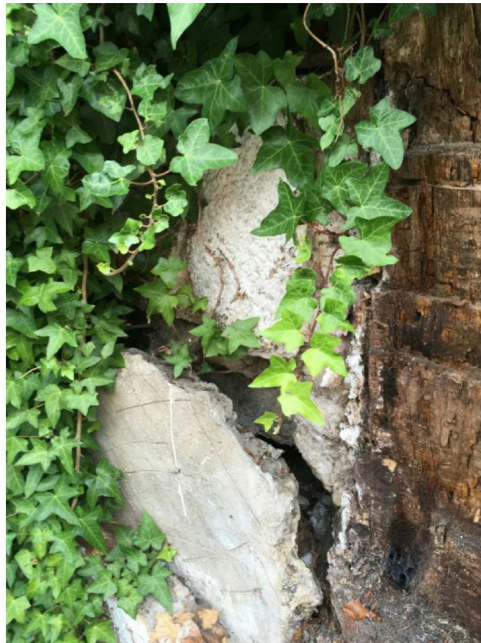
Cracking at junction between rear party fence retaining wall and tree stub taken from No.30
